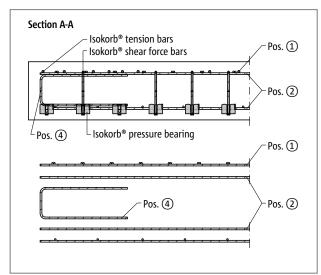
Schöck Isokorb® T type K-E, K-T: On-site reinforcement on the balcony side in section A-A; Pos.4 = supplementary edge reinforcement on the free edge perpendicular to the Schöck Isokorb®
